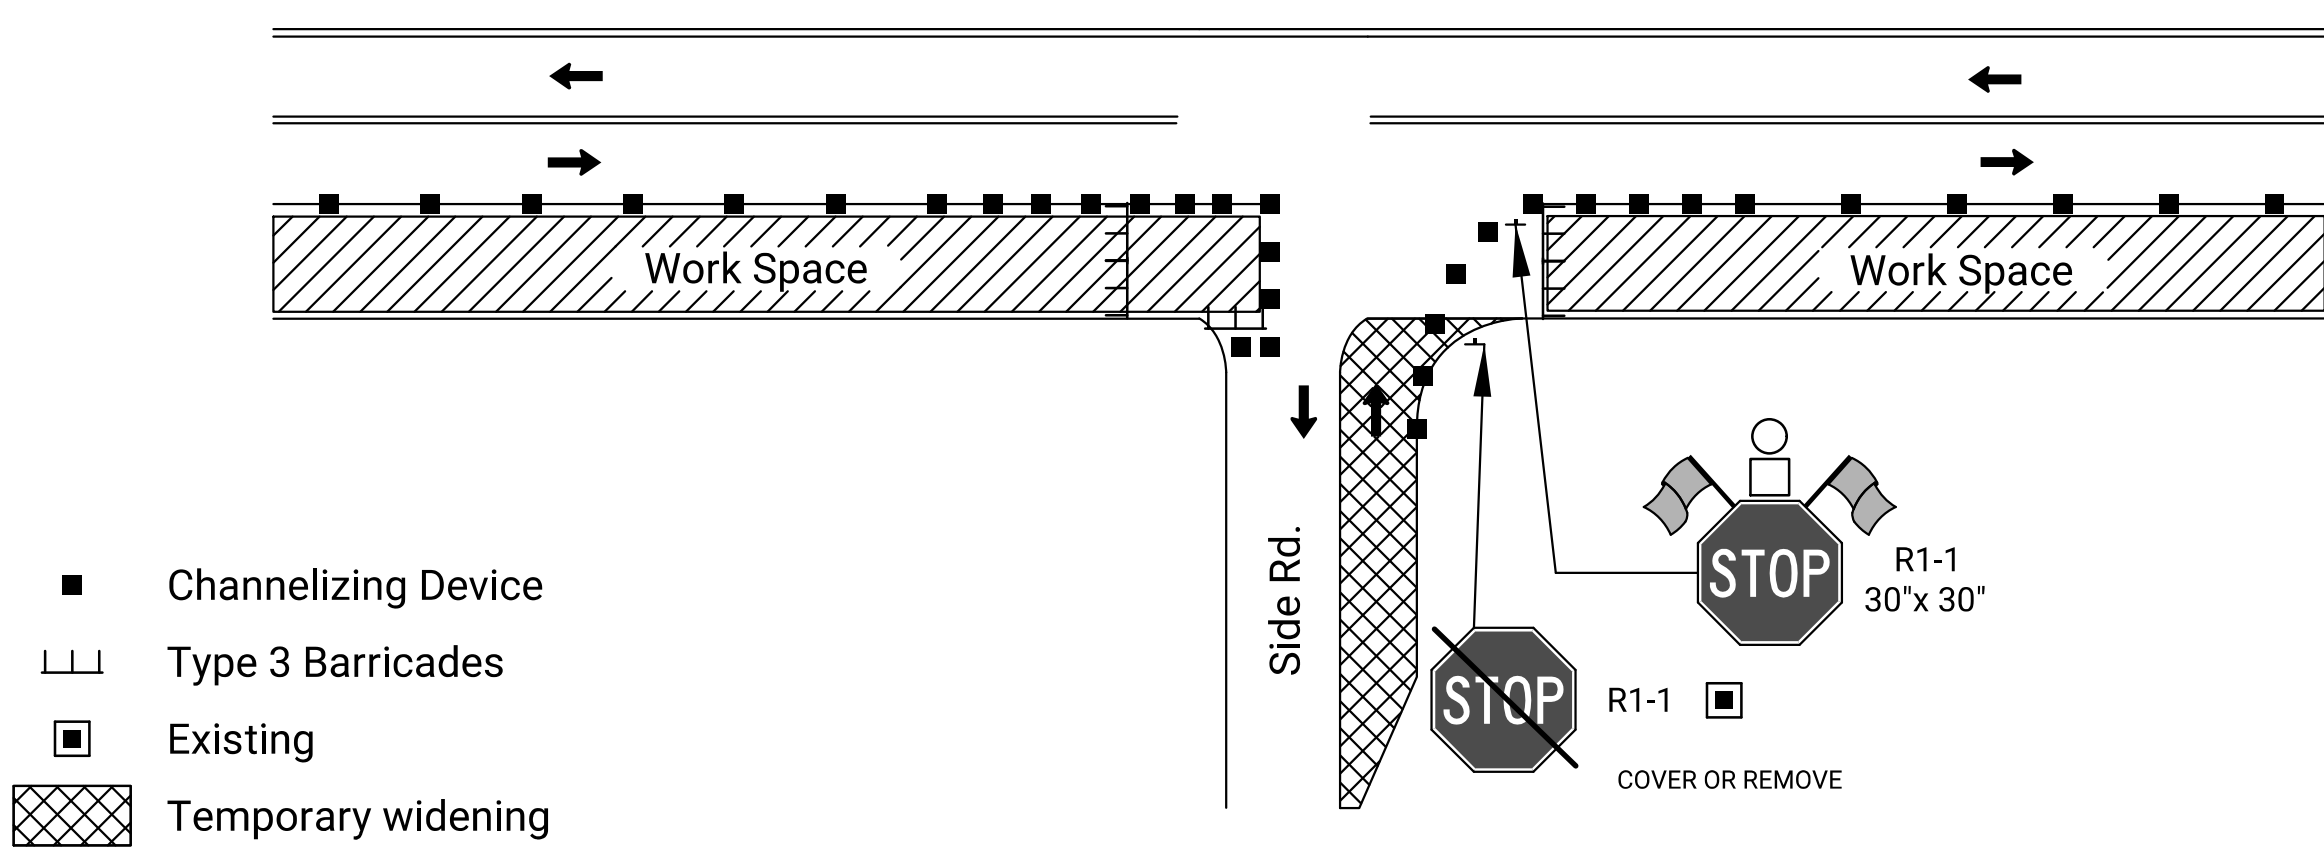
SIDE ROAD OR ENTRANCE CONSTRUCTED HALF AT A TIME:
